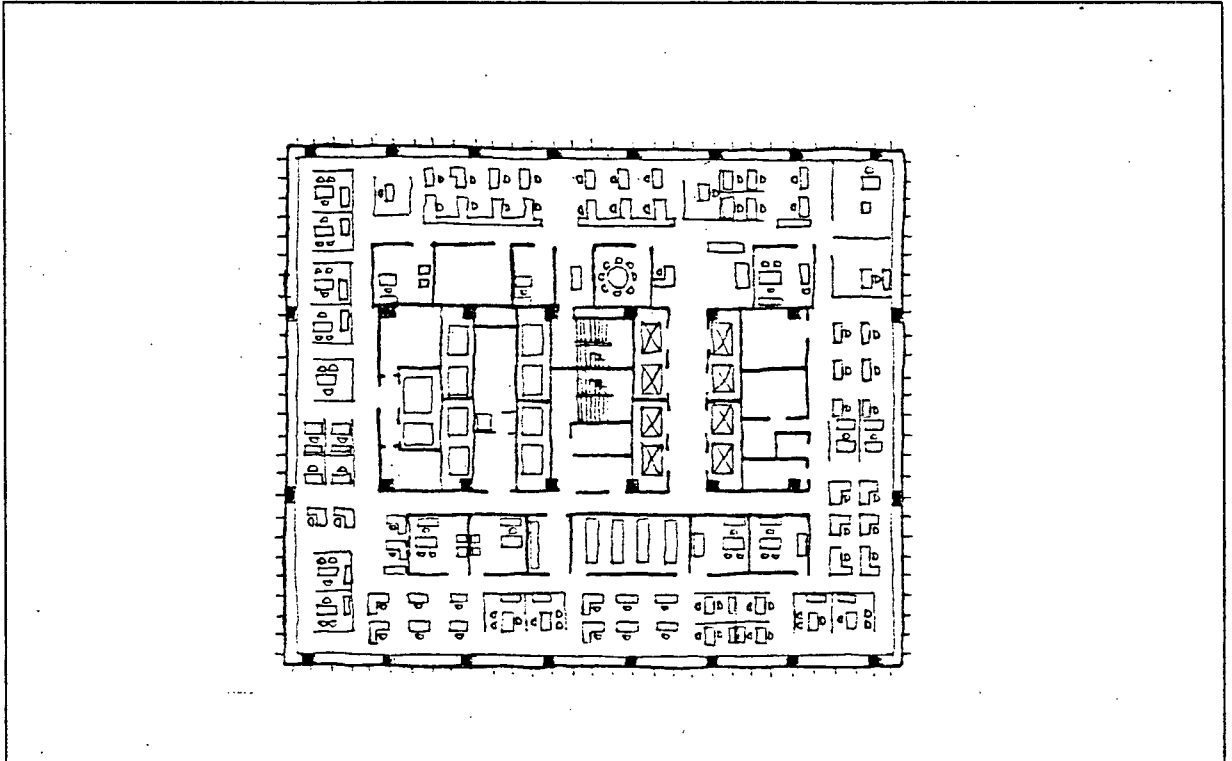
A recent example of office floor plan having cellular offices on the interior
